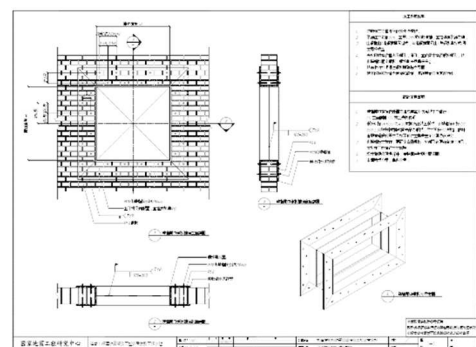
Schematic diagram of typical street house brick wall opening reinforcement construction method (brick wall thickness below 1B)
